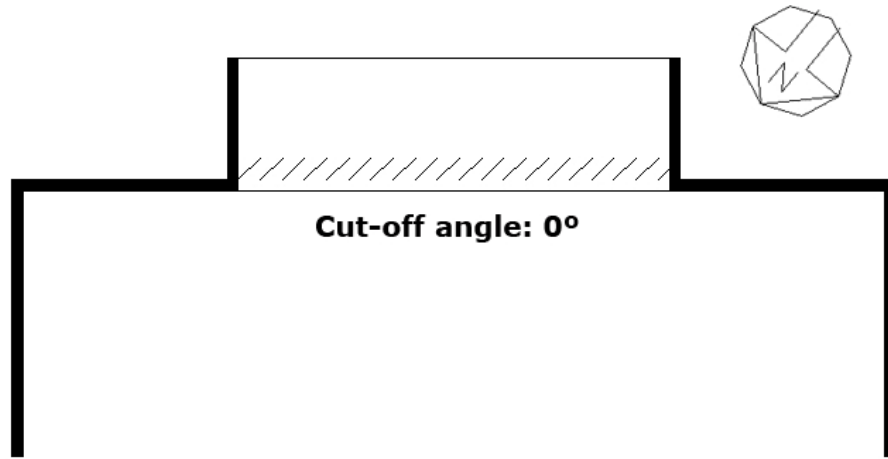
Dimension of shadings for southeast facing opening in Building 3
